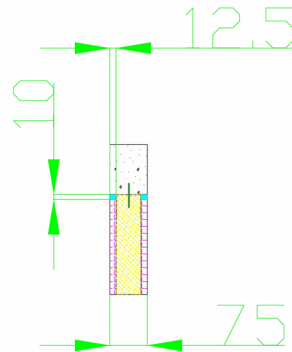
wall gypsum to stone thickness ≥ 100 mm
